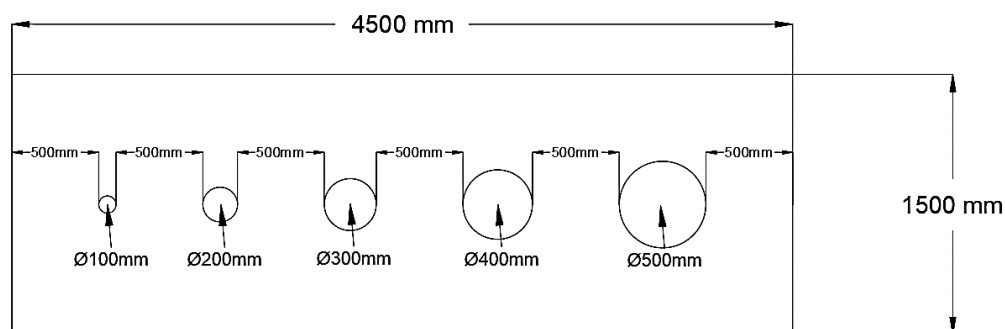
Plan view of the concrete specimen with artificial subsurface crack.
